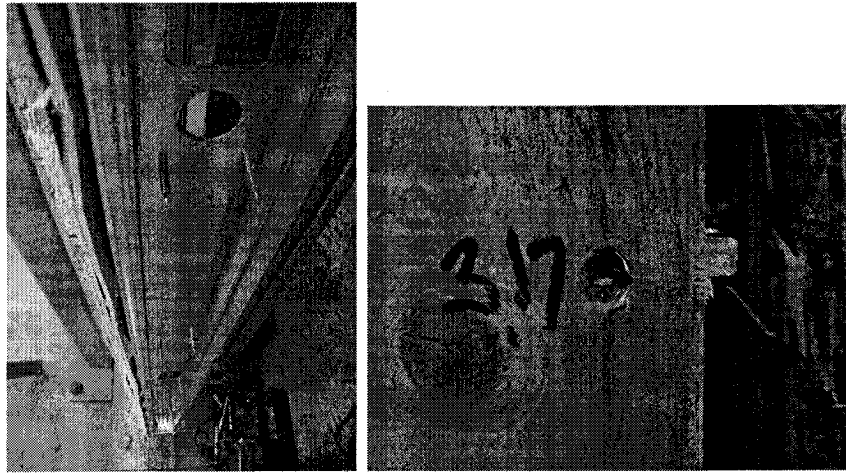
Partial pull-through failure of complete side of shear wall (left); Combination of pull-through and wood bearing failures (right)
